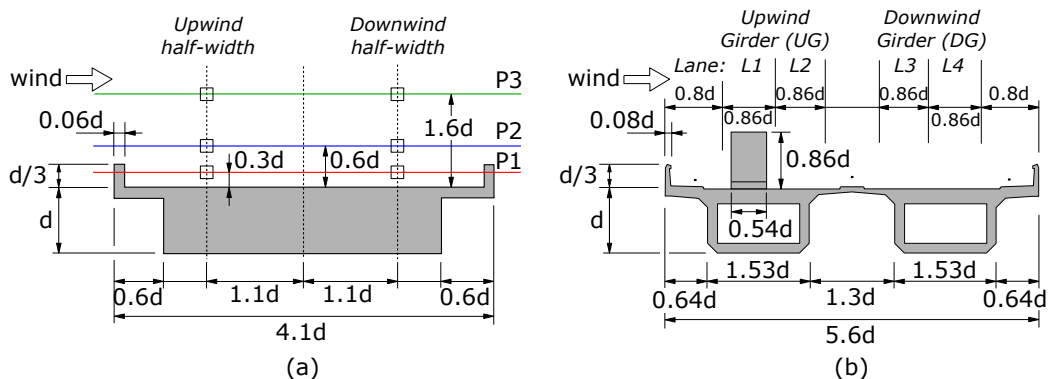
Dimensions of the bridge cross-sections in terms of their depth d : (a) idealised generic bridge, (b) typical bridge with a high-sided vehicle.
